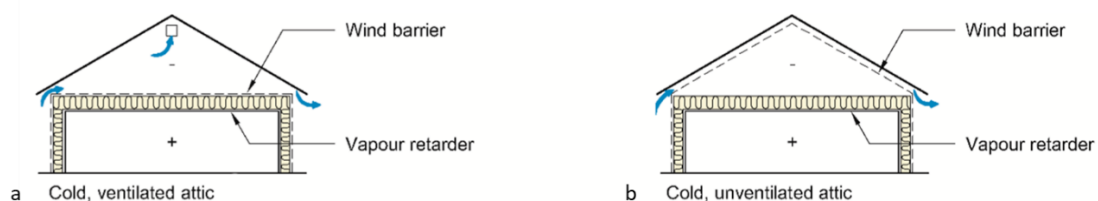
Roof with cold attic. (a) Cold, ventilated attic space with air stream flowing through the attic itself. (b) Cold, unventilated attic space with all ventilation between the underlayer roof and the roof covering (Gullbrekken, 2018).
